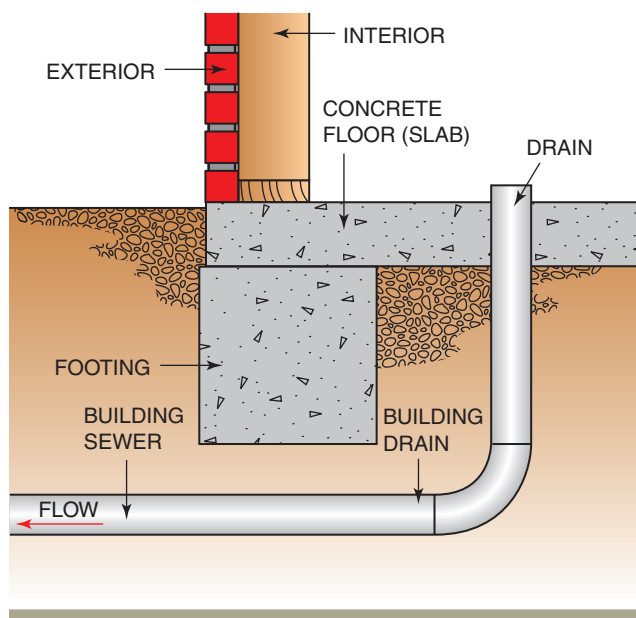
A house built on a concrete slab requires that the building drain be installed below ground.
